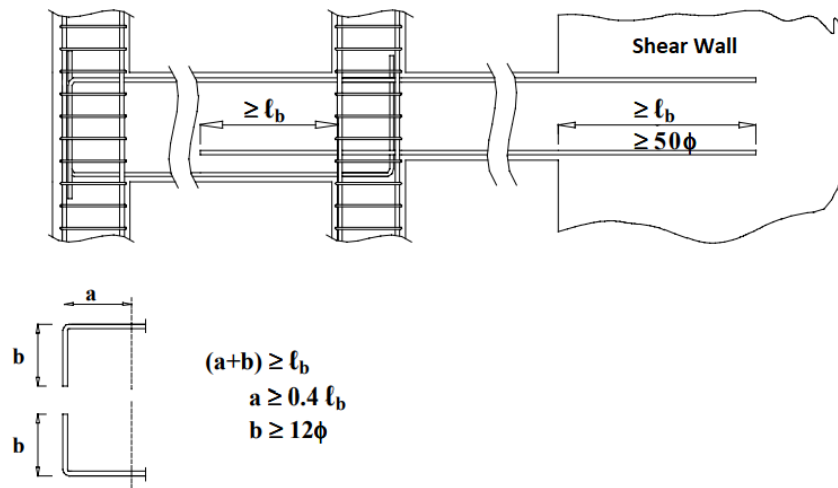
The calculation of the anchorage length at the beam-column joint (TEC, 1998).
